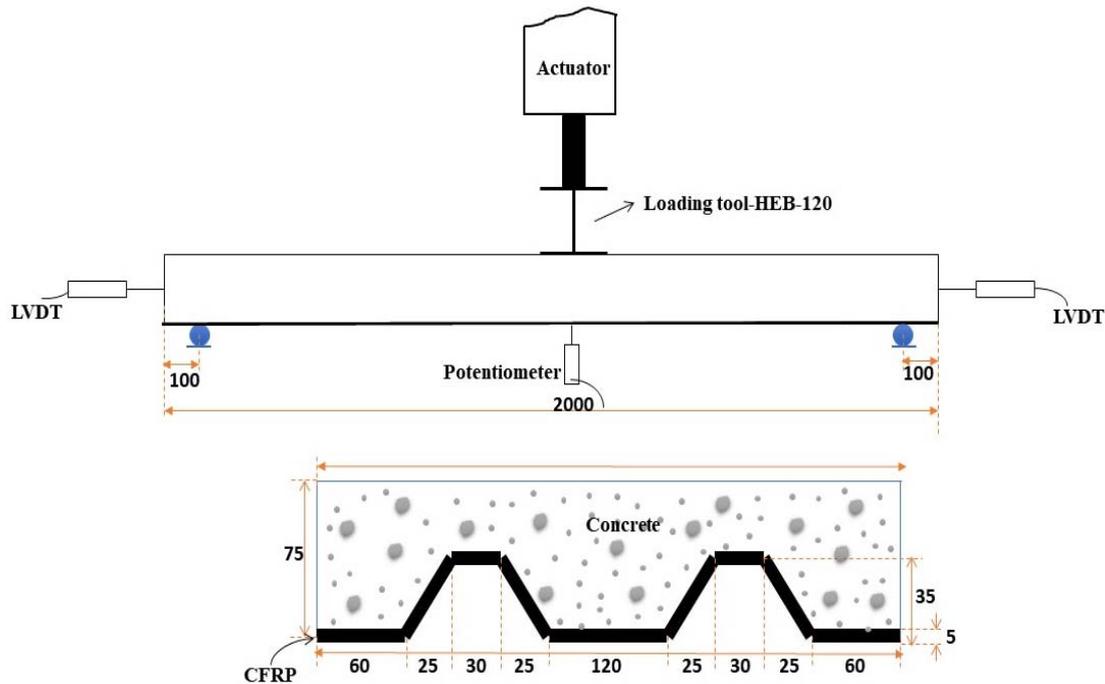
Test setup configuration and specimen's details (dimensions in mm).
